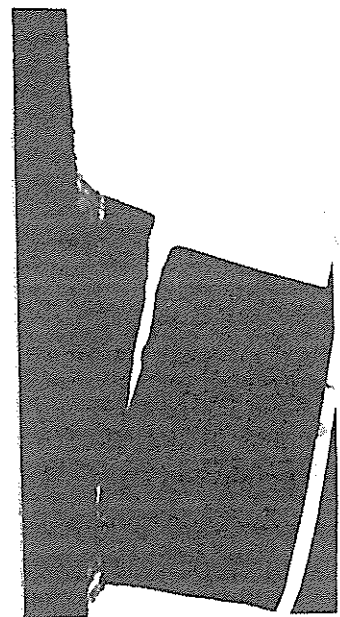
Fracture at end of horizontally fixed specimen IAIII.
